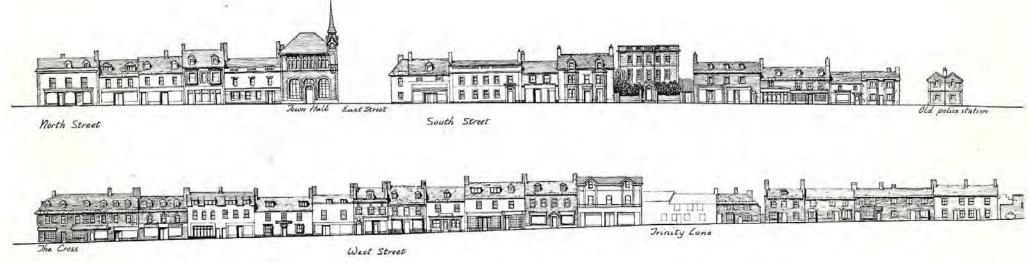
Wareham Street Elevations (Wareham Conservation Study, DCC, 1969)
